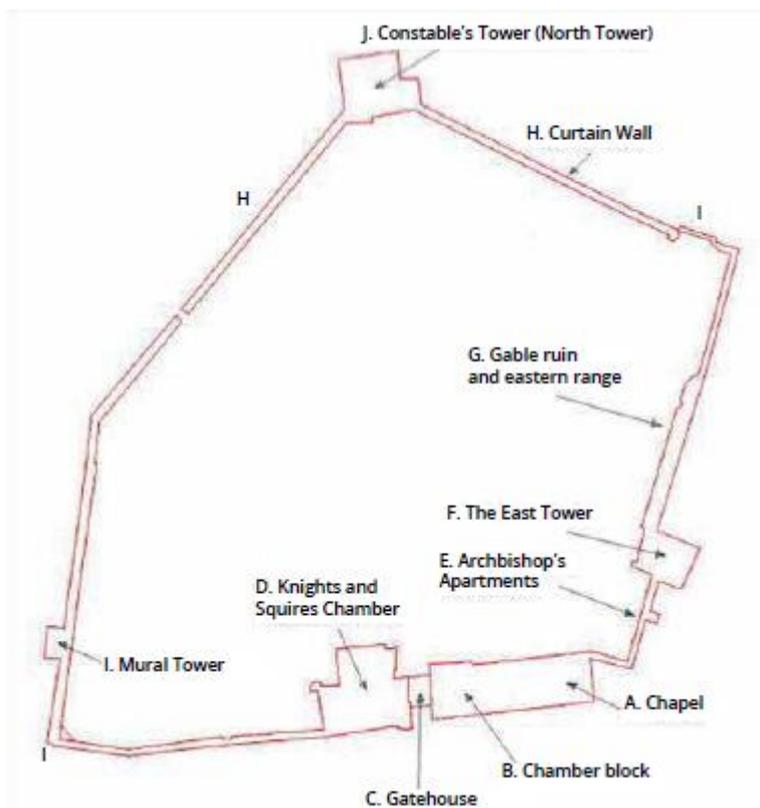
Swords Castle Site layout (Swords castle Conservation Plan)
